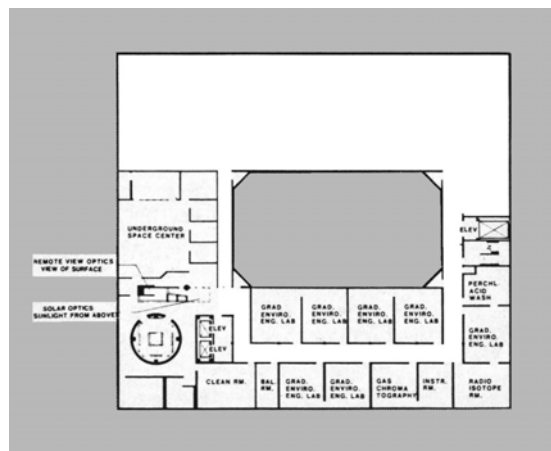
Mined space floor plan housing the mined and environmental engineering laboratories.
